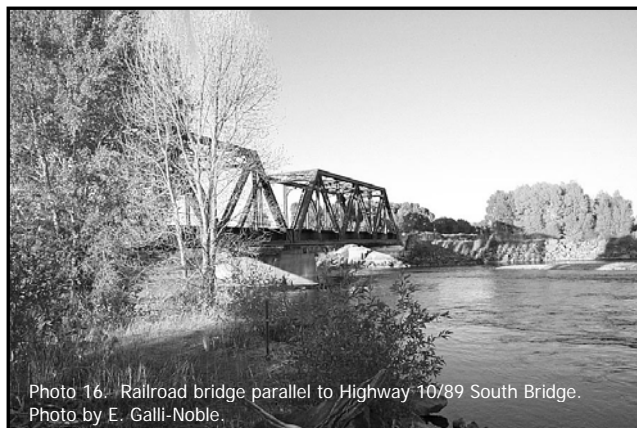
Railroad bridge parallel to Highway 10/89 South Bridge. Photo by E. Galli-Noble.
